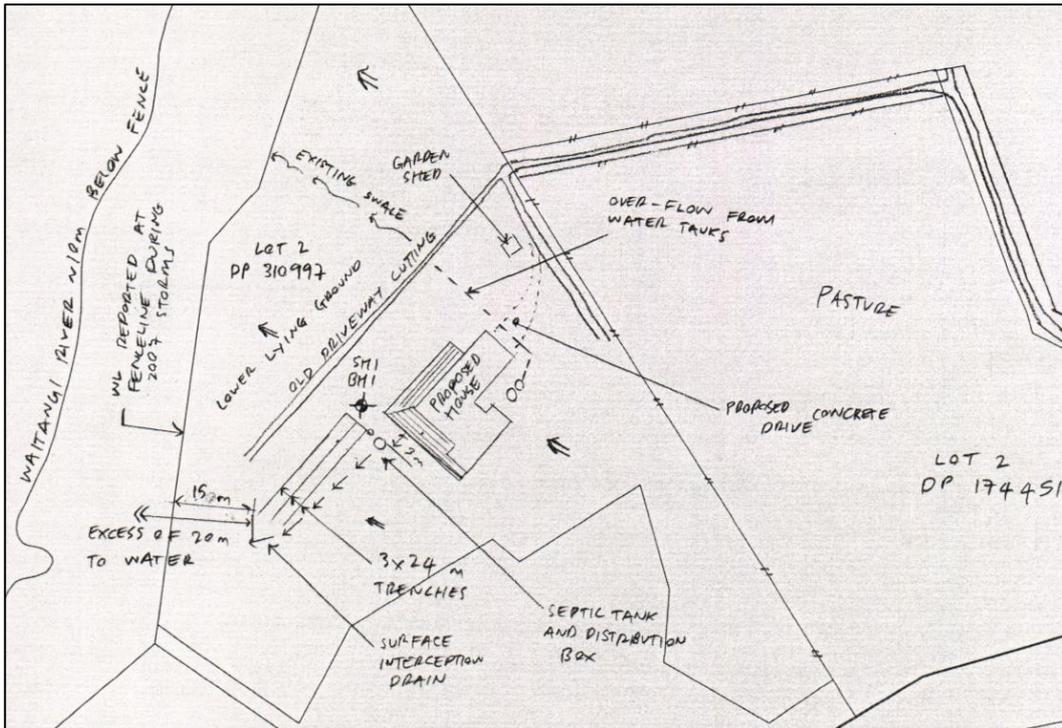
Lot 2 existing wastewater system (BC 2009-1529)
